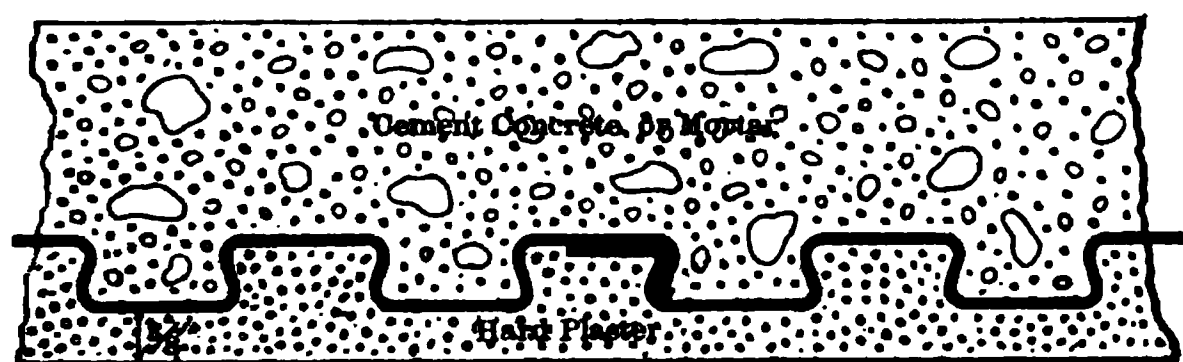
Ferroinclave Reinforcement for Concrete Floors
